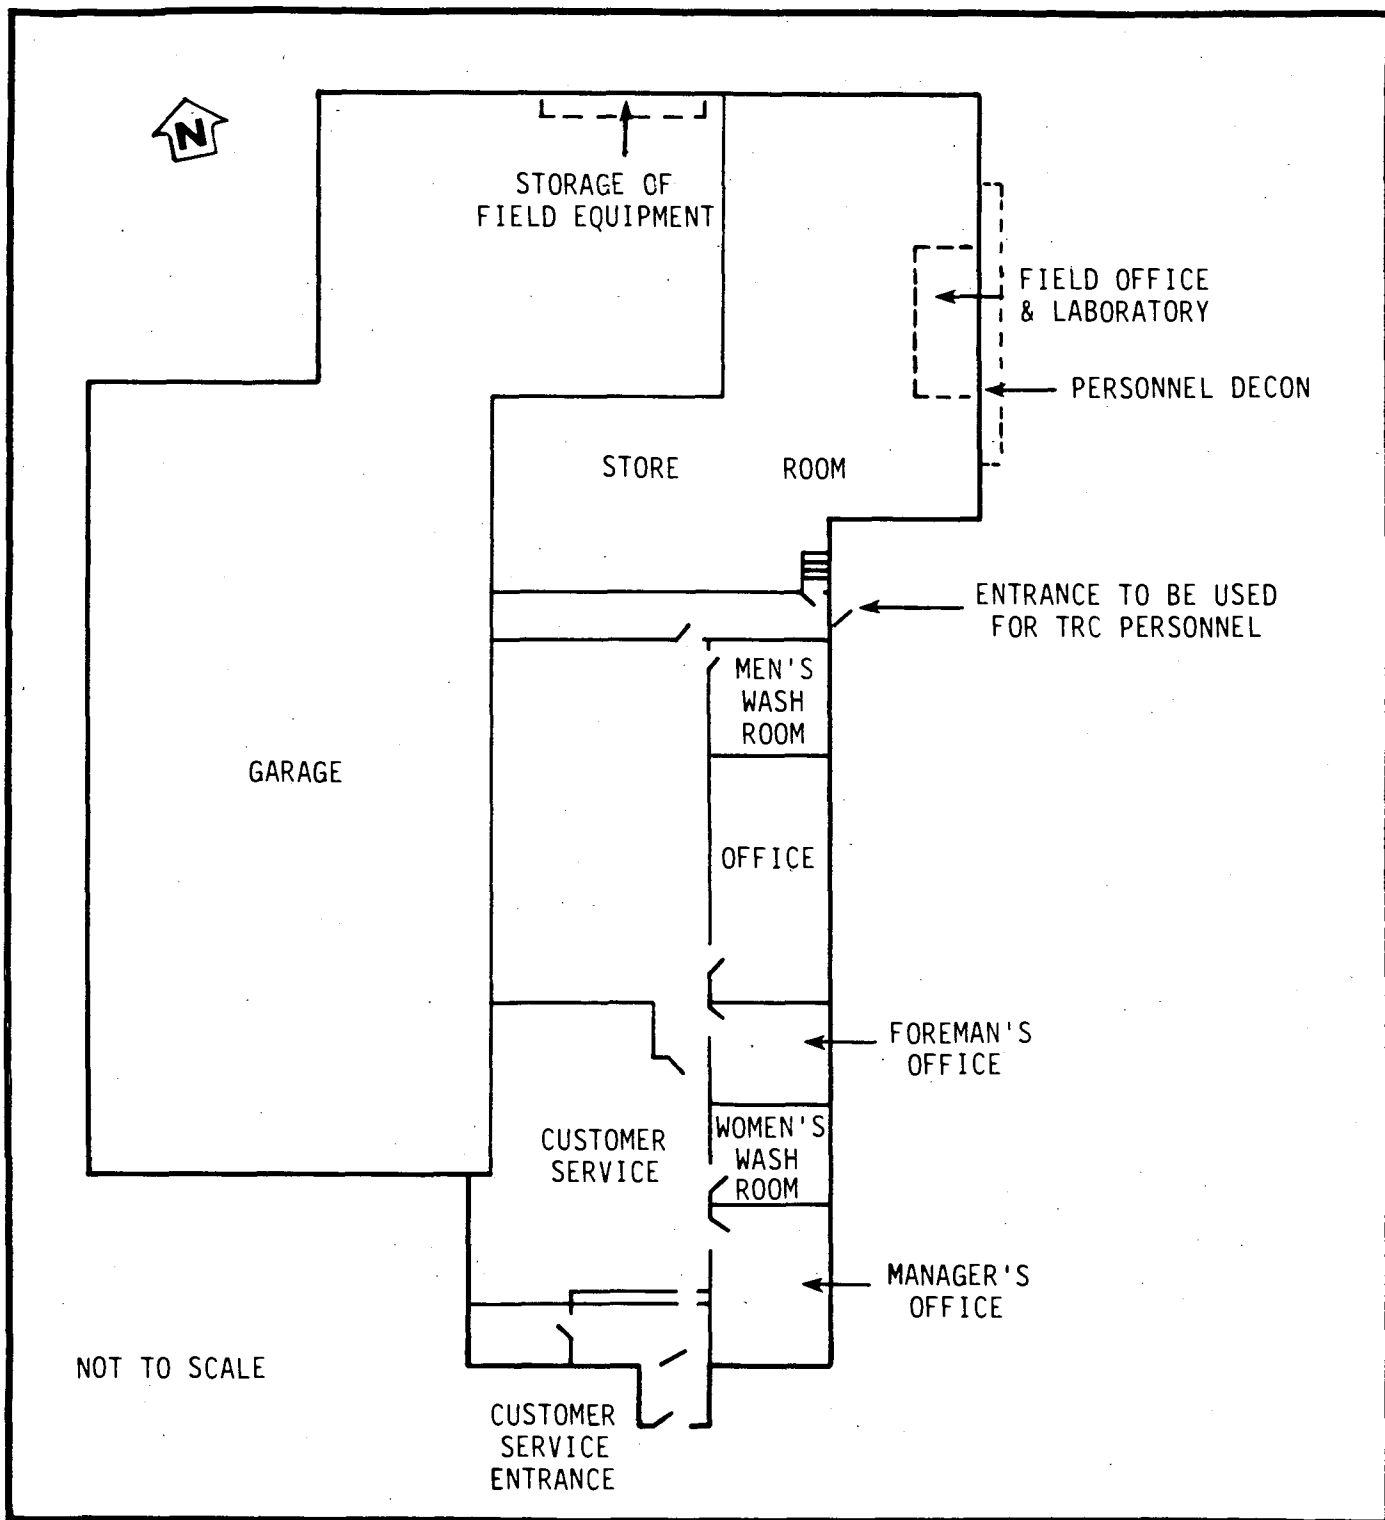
FIELD OFFICE, FIELD LABORATORY AND STORAGE
